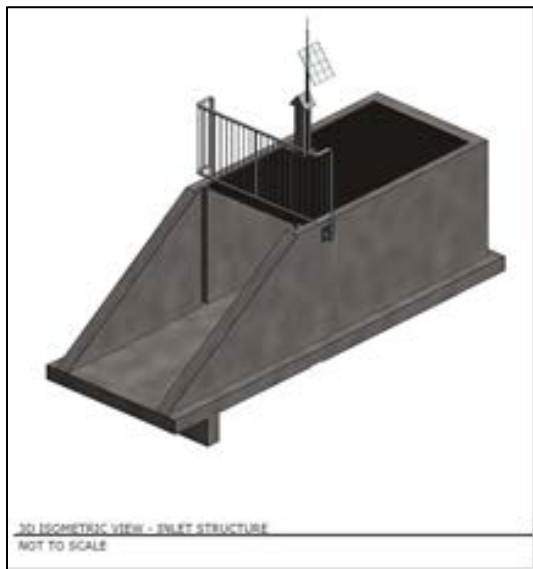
Design for the reinforced gated inlet structure for the Pasco Pump Lateral 5.8 Wasteway.
